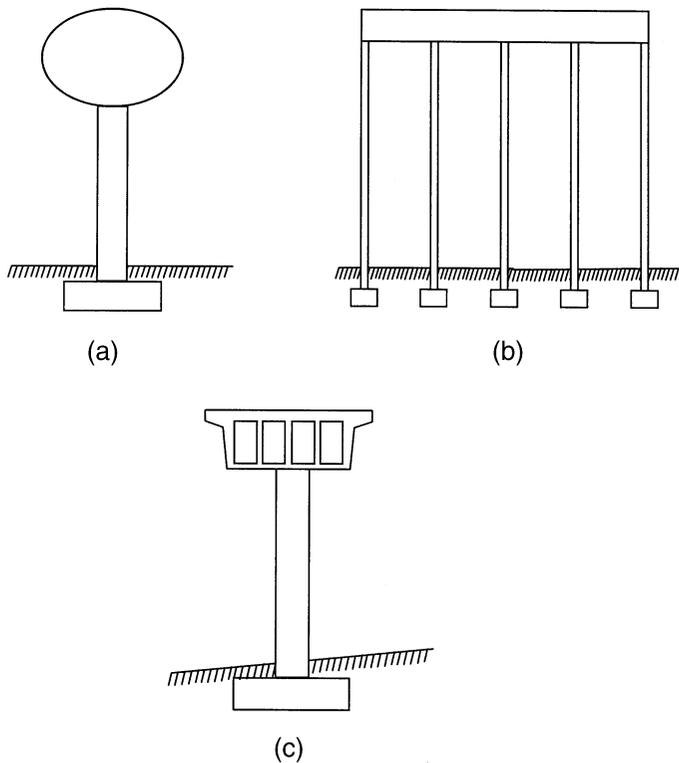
Examples of SDOF structures. (a) Water tank supported by single column; (b) one-story frame building; (c) two-span bridge supported by single column.
